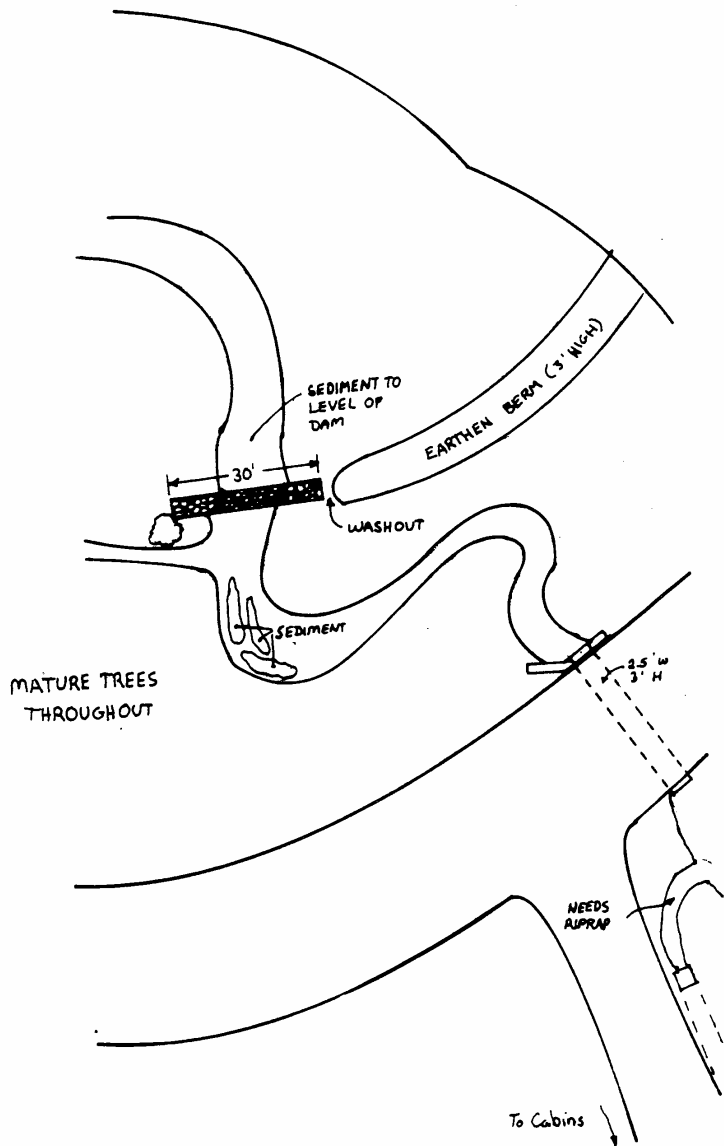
(c). Plan view of check dam and surroundings at Site 3.
